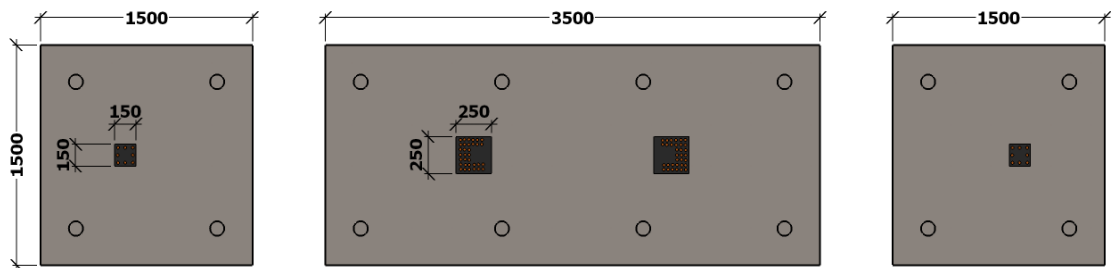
Plan View of the Foundation (All dimensions are in mm)
